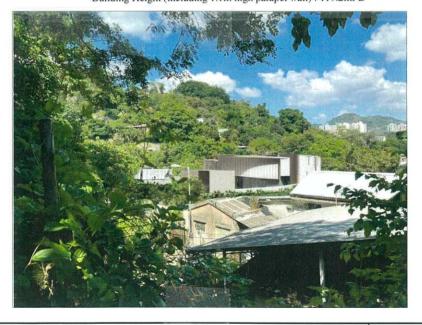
Previous Columbarium at the Site (Building Height 116.7mPD)
